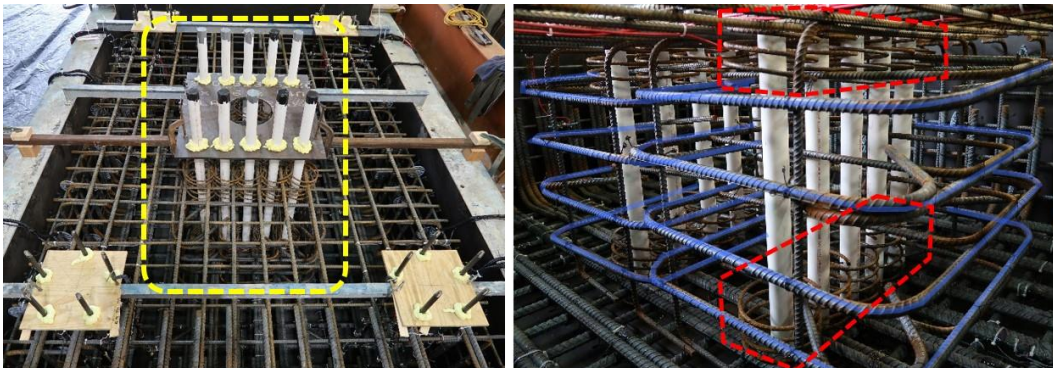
Reinforcing bar cage before cast concrete (left) and reinforcement detail to resist post-tensioning force (right)
